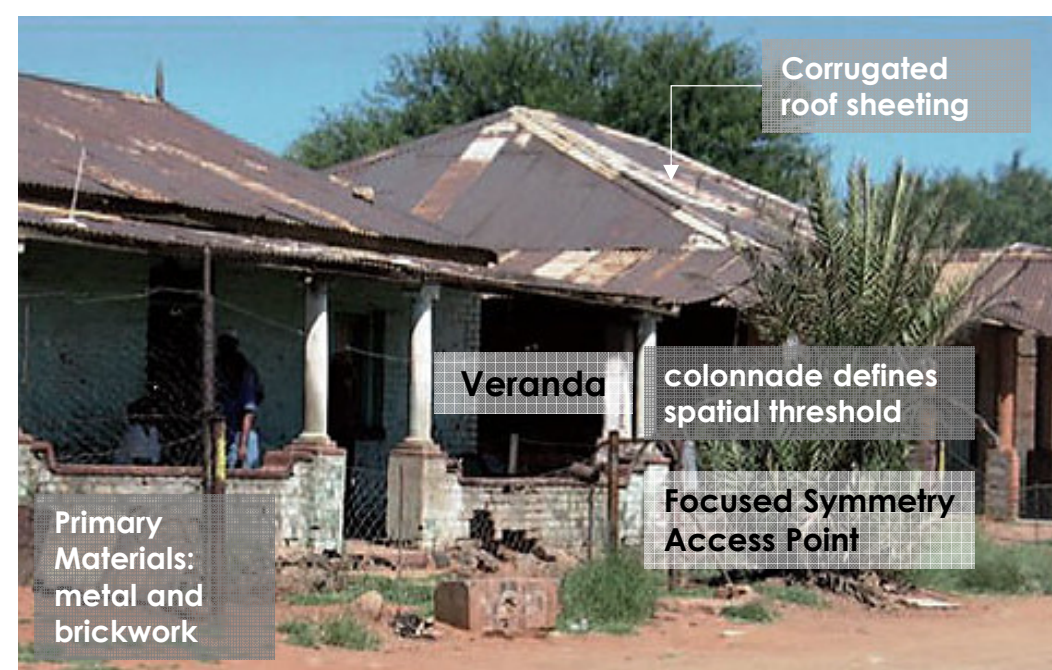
Photograph of typical township residence typology in Kimberley (Kimberley City Info, 2022: online).
